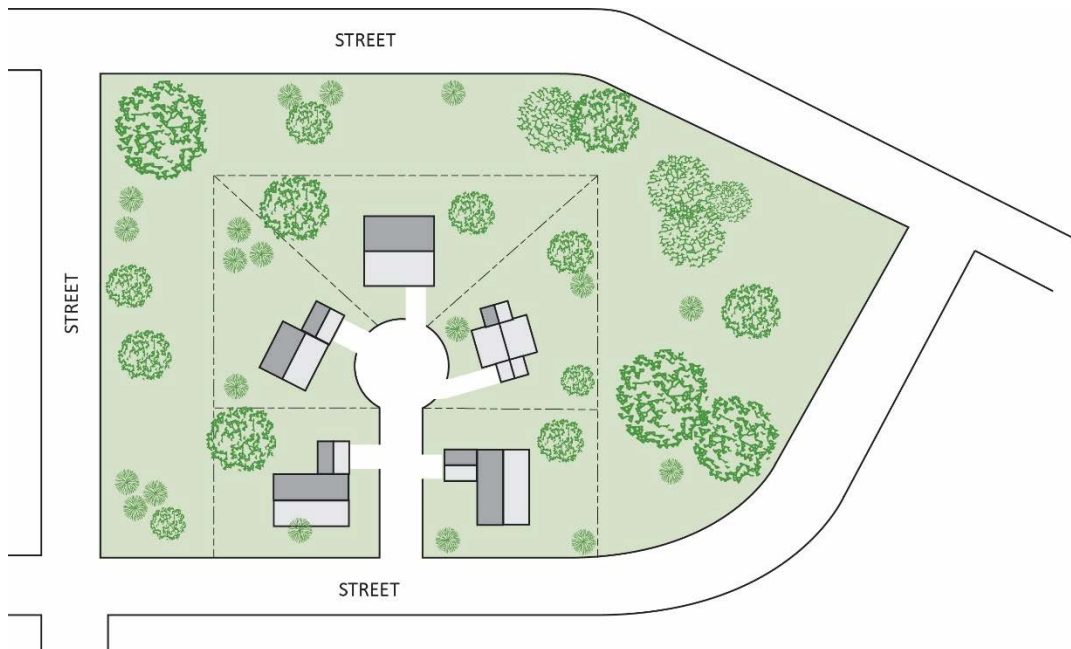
3 - Example of Site Plan – Clustered Dwelling
